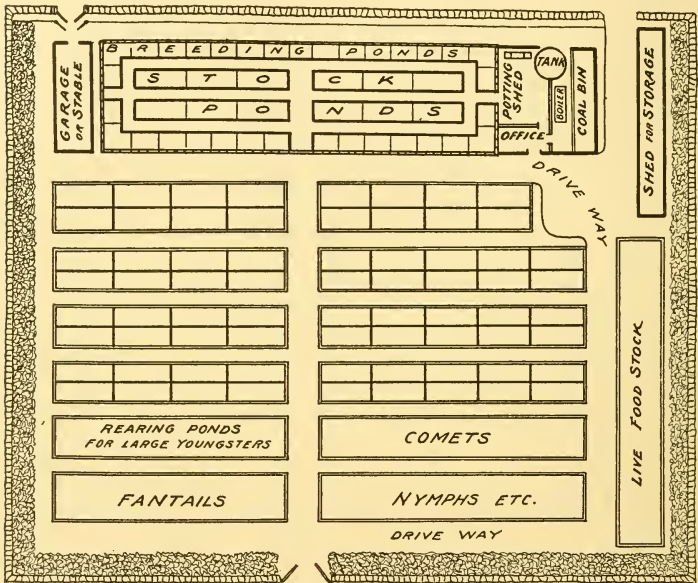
WHOLESALE BREEDING ESTABLISHMENT, SHOWING GREENHOUSE AND OUTDOOR CONCRETE TANKS
